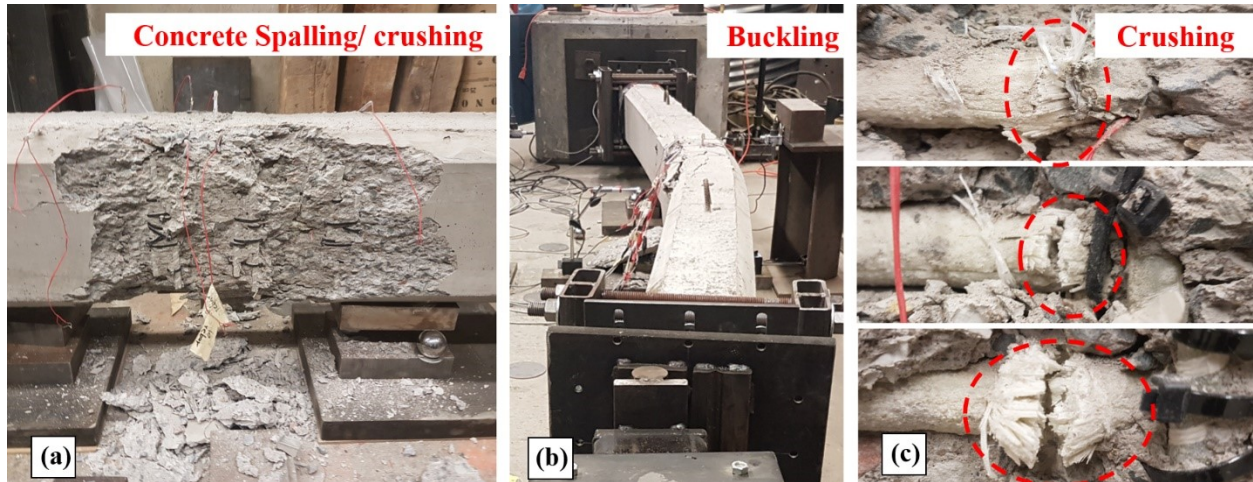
Failure modes: (a) concrete crushing/ spalling (CC); (b) global buckling (GB); and (c) GFRP crushing (GC).
